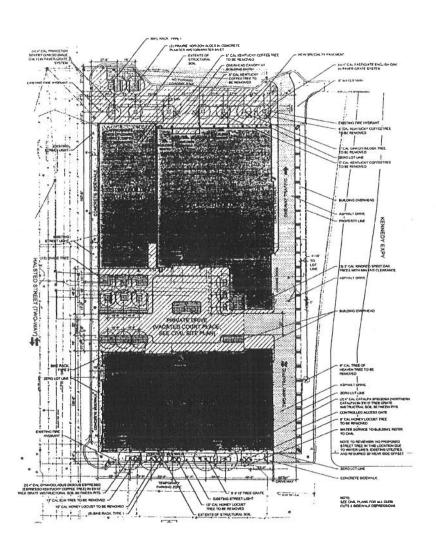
A: SITE AND LANDSCAPE PLAN
